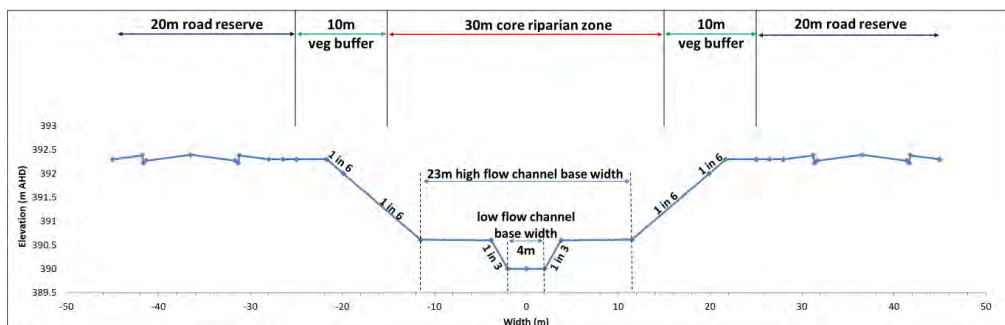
Conceptual arrangement of a typical cross section for a 50m wide waterway corridor
